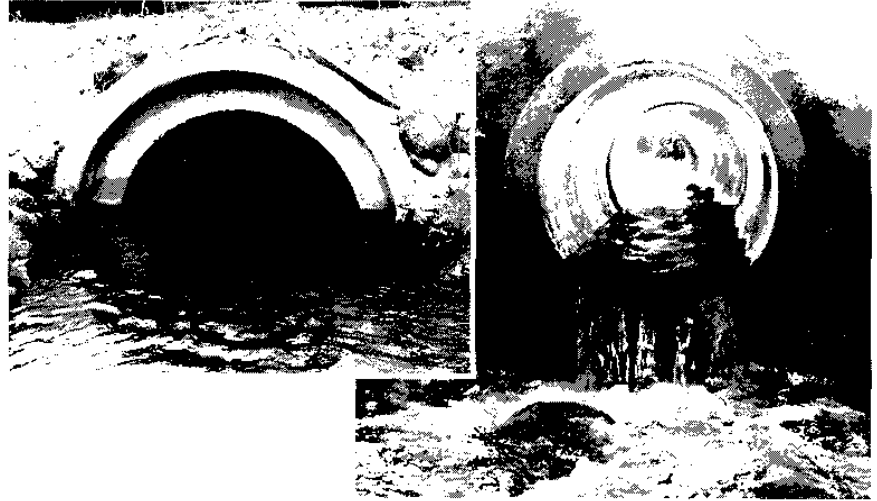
Here is a picture of a sensibly constructed culvert... and a badly constructed one!
